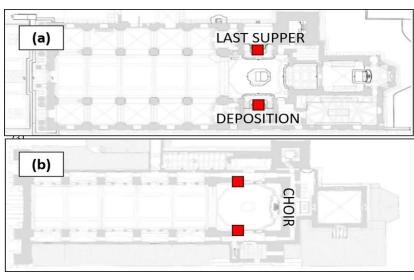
Planimetry of (a) the ground floor and (b) the first floor with the indication of the three 236 sampling sites. 237
